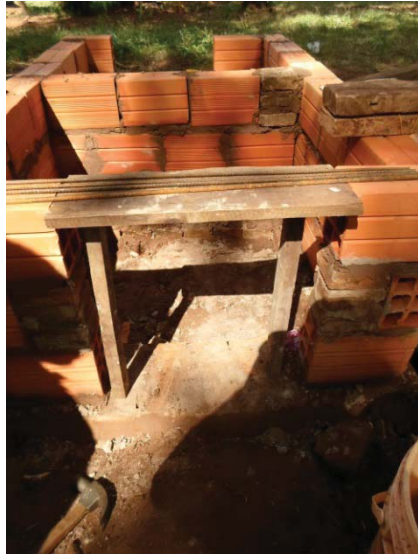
Formwork made from scrape wood used to support bricks over door opening. Photo by author.
